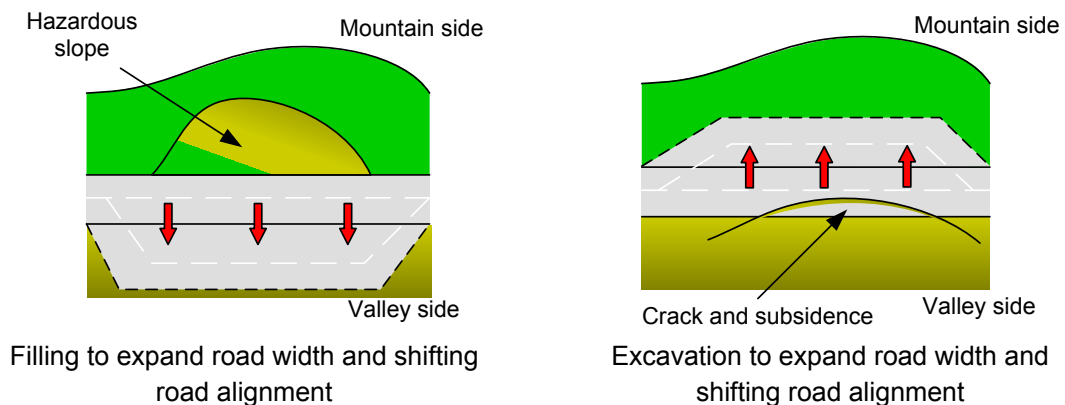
Schematic Drawings of Examples of Minor Shifting of Road Alignment
